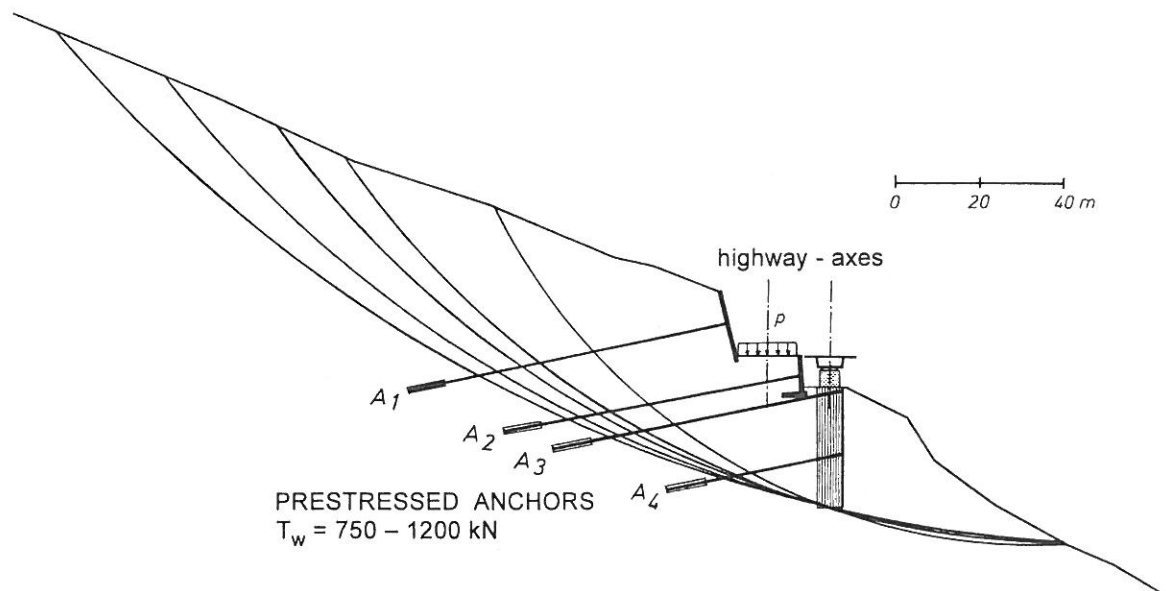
Cross section of a "semi-bridge" on deep caissons in a slide-prone slope. Bridge, cantilever wall, and element wall tied back with prestressed anchors. Example for assessing the required anchor lengths from various slide surfaces, running through the caisson's base.
